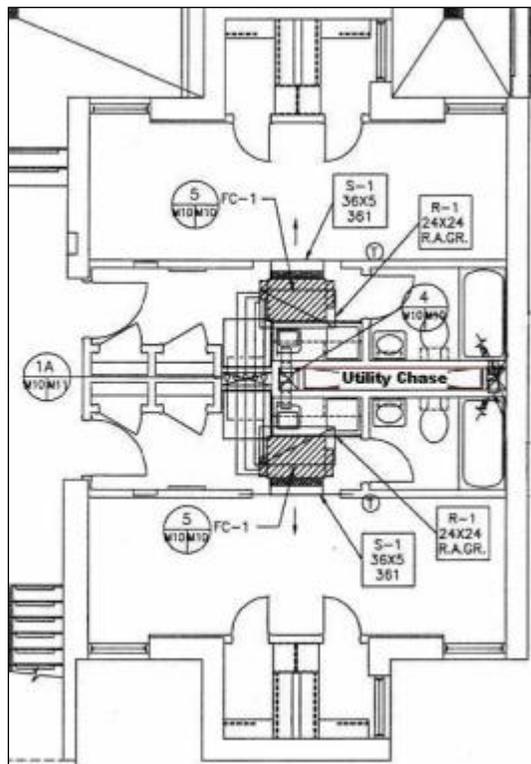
Floor plan of occupant rooms (two rooms shown).
